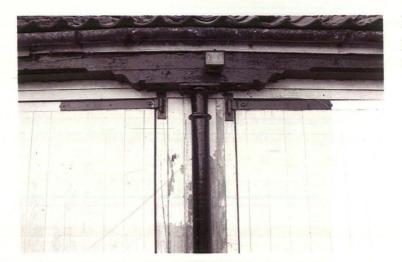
NE-SW Range, iron stanchion, pad and chamfered beams, looking northwest
